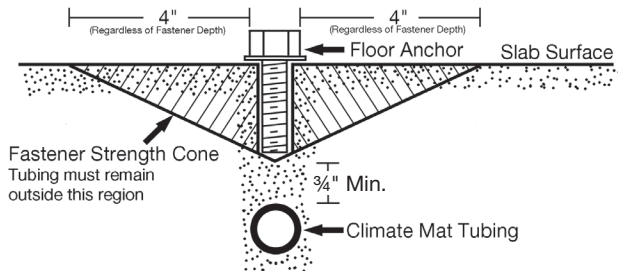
Minimum $\frac{3}{4}$ " of concrete between anchor bolt hole and Climate Mat. Strength cone diagram showing tube placement
